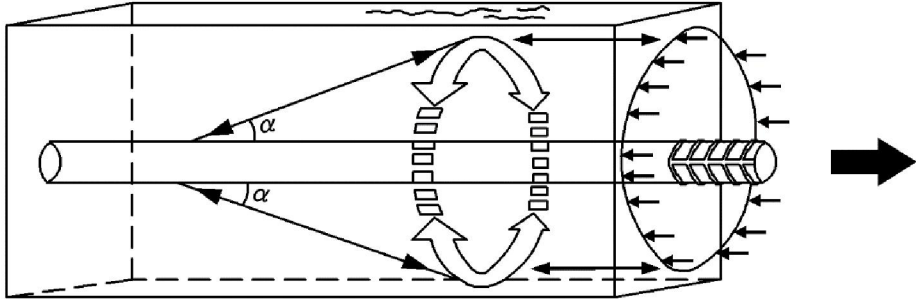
Schematic of Internal forces within reinforcement concrete specimen (Tepfers, 1979)
